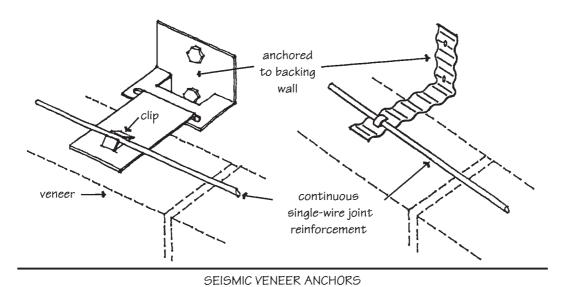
Seismic requirements for masonry veneer. (*Based on Masonry Standards Joint Committee*, Building Code Requirements for Masonry Structures, *ACI 530/ASCE 5/TMS 402*.)
